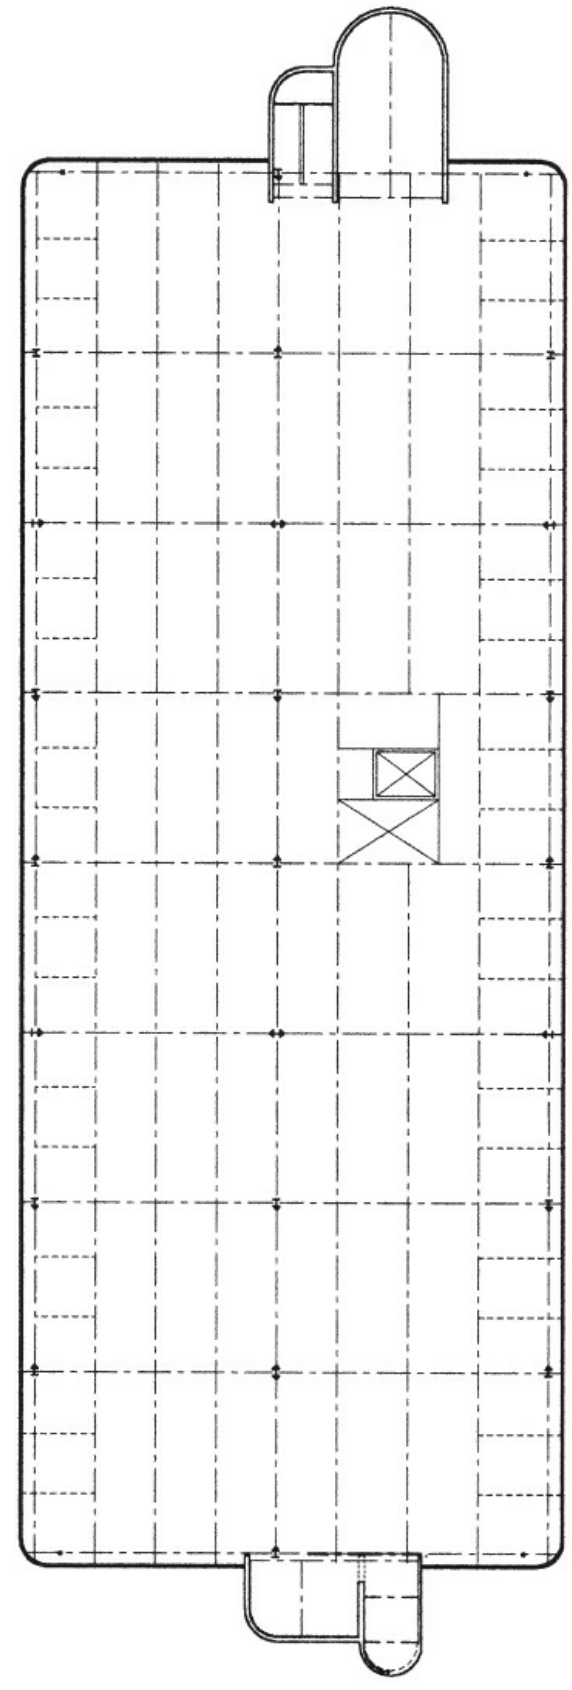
(#) Madison Building—Stage II: Working drawing—third...floor framing plan.
